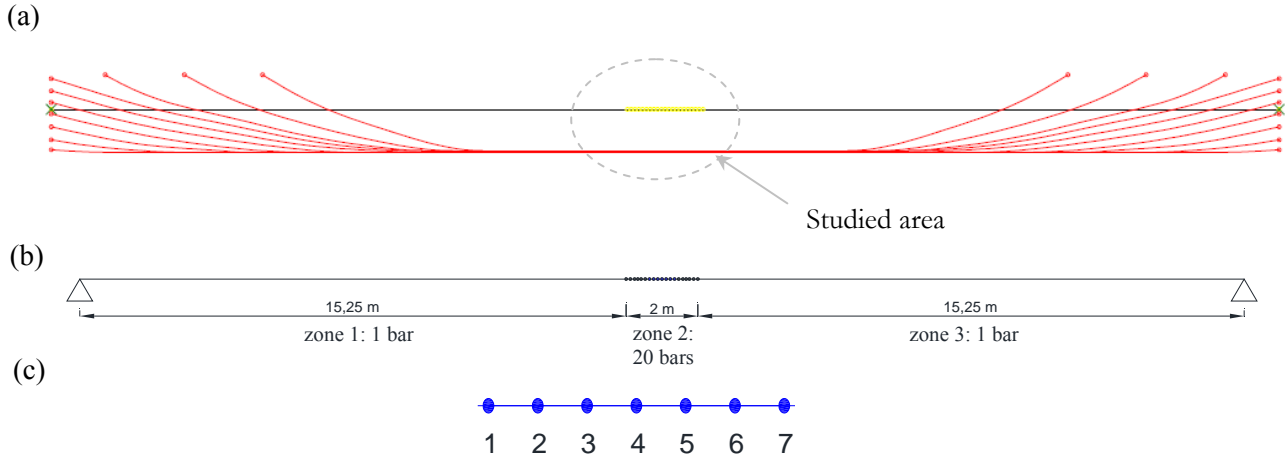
(a) Modeling of the beam, (b) studied areas, and (c) detail of the seven sections in zone 2.
